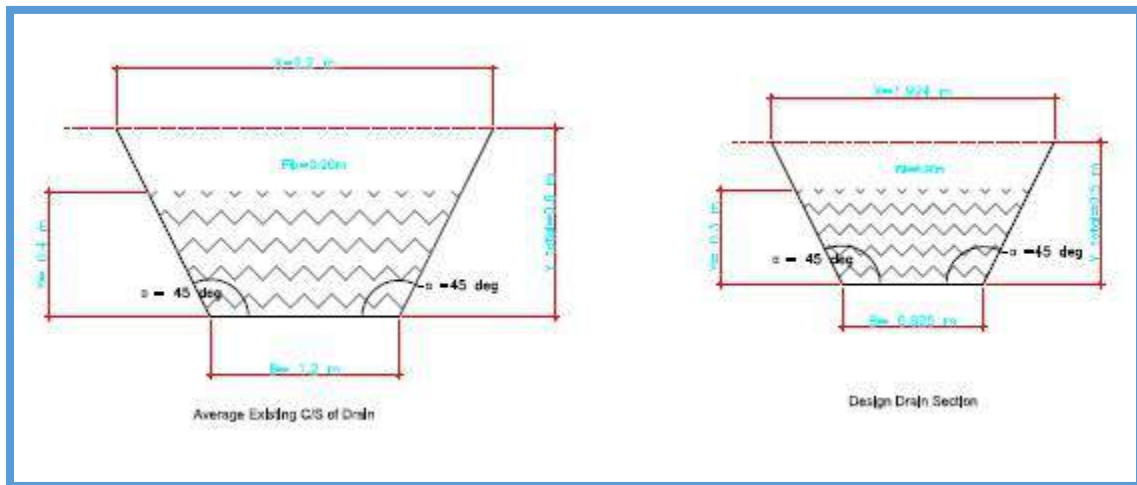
Typical Drain Cross Section for Peters Hall Roadside Earthen Drains
